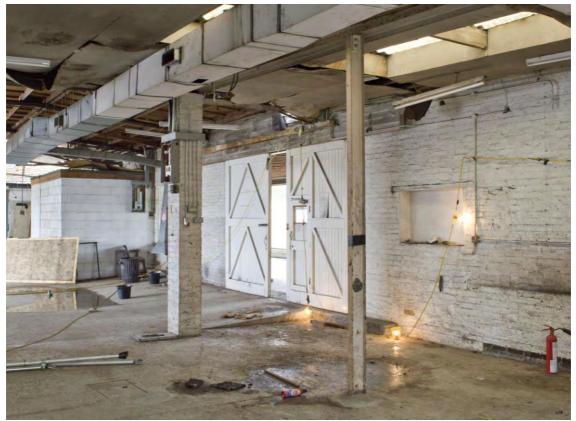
Detail of the sliding double doors providing access between the northern and southern halves of Range 3, facing north-east (54)
